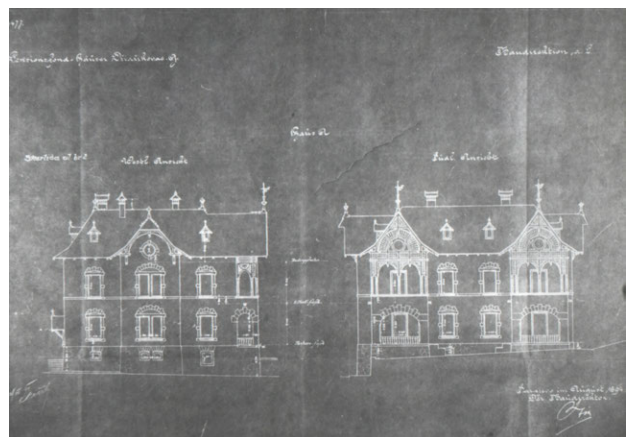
Private houses in Džidžikovac, Sarajevo: elevation views of the main façades of houses „A” and „B.” Project done for house „A” done by Carl Panek in 1894 (Dimitrijević 14.c)
